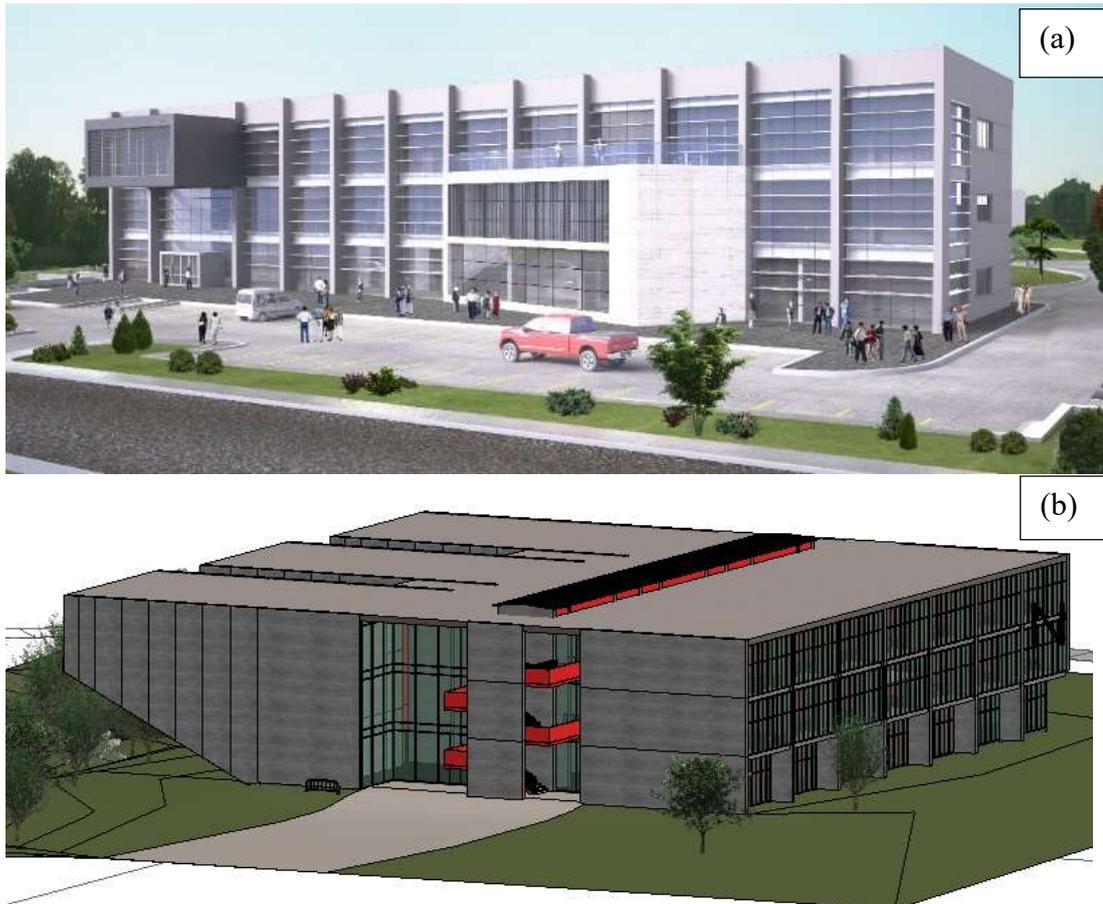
(a) Rendering of Educational Science Department Building and (b) Revit 3D Model for Classroom Hall Building (Courtesy of METU).
